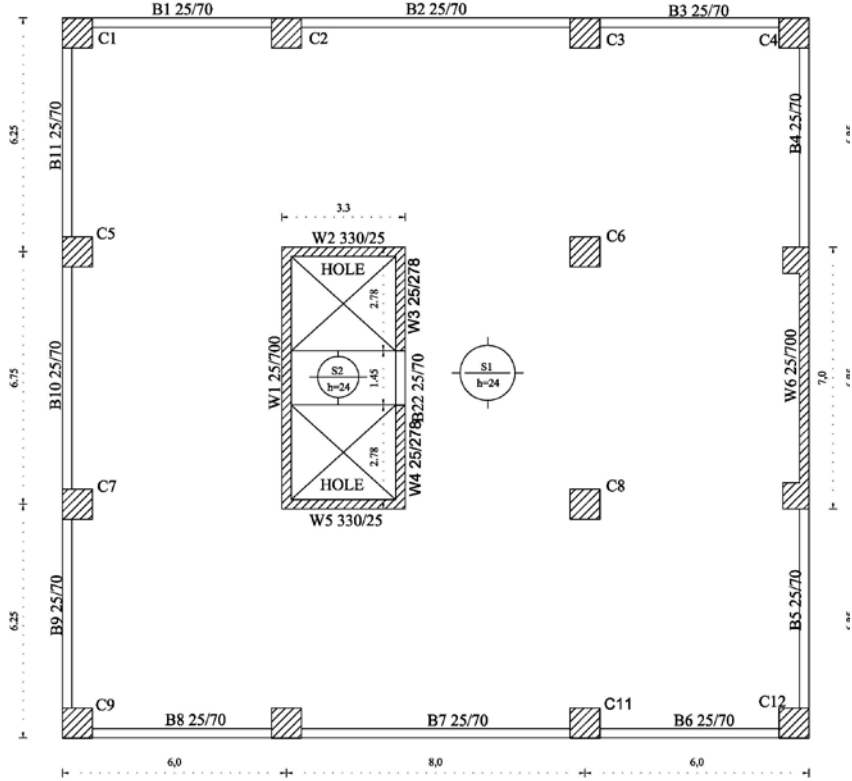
Plan view of a typical floor of the “new” building without internal beams
